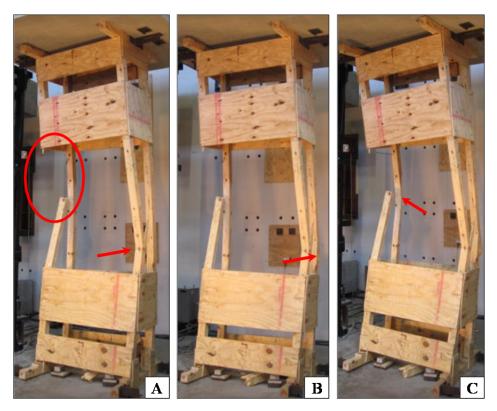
Failure Modes A) Initial Failures B) 3rd Failure C) 4th Failure
